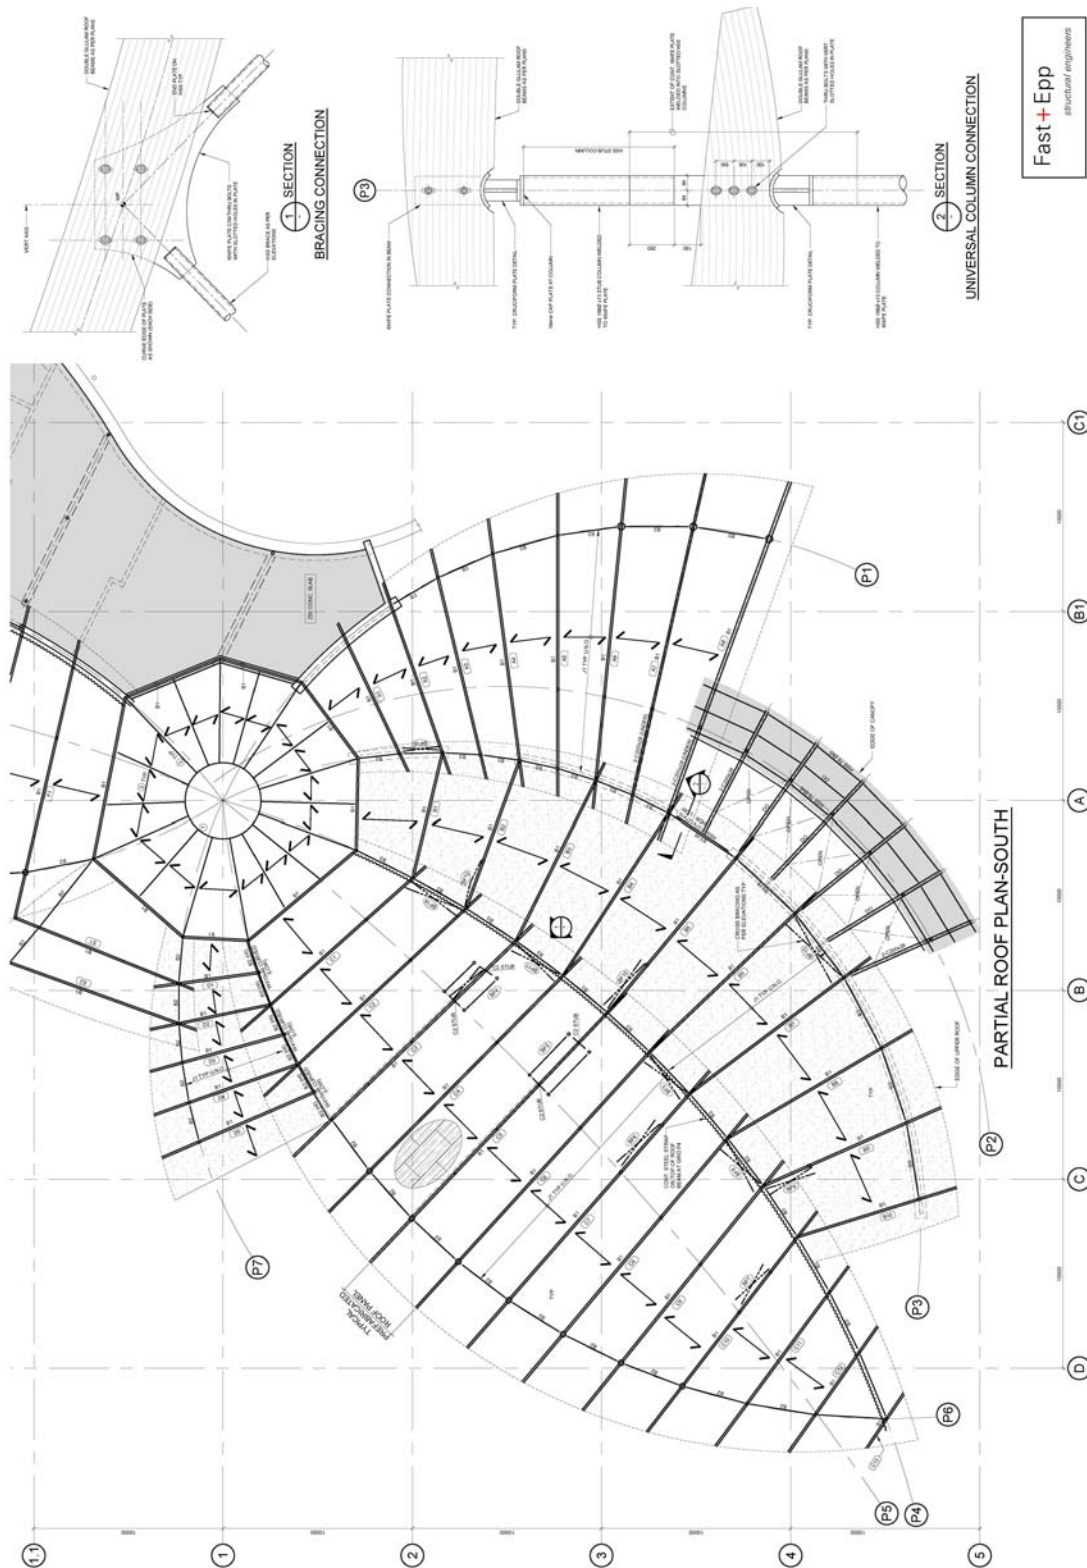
Partial roof plan showing the simplicity of trapezoidal shaped panel layout to achieve complex roof form.
